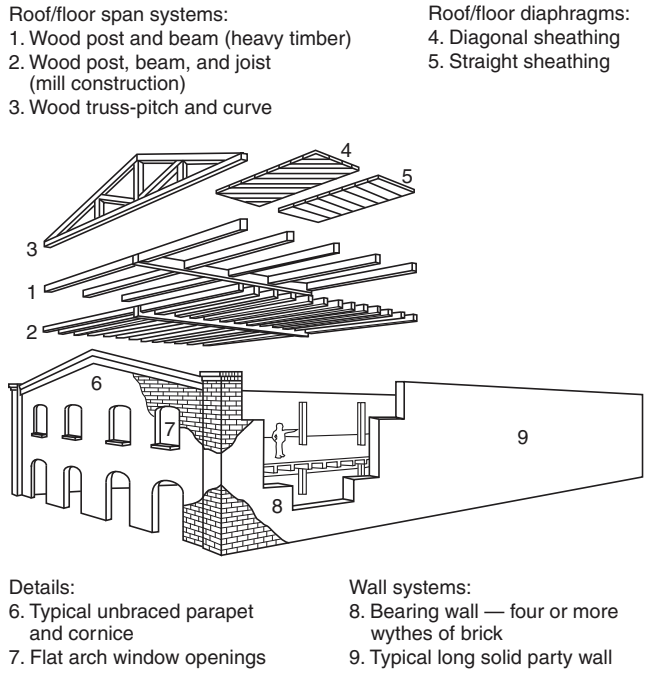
(l) Unreinforced Masonry Bearing Wall, Example 1 of 3.
